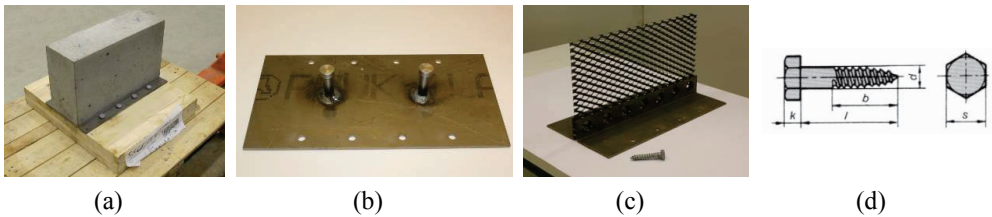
(a) CLT-concrete shear test specimen. (b) steel plat with headed studs, (c) steel plate with expanded metal mesh. (d) coach screw.
